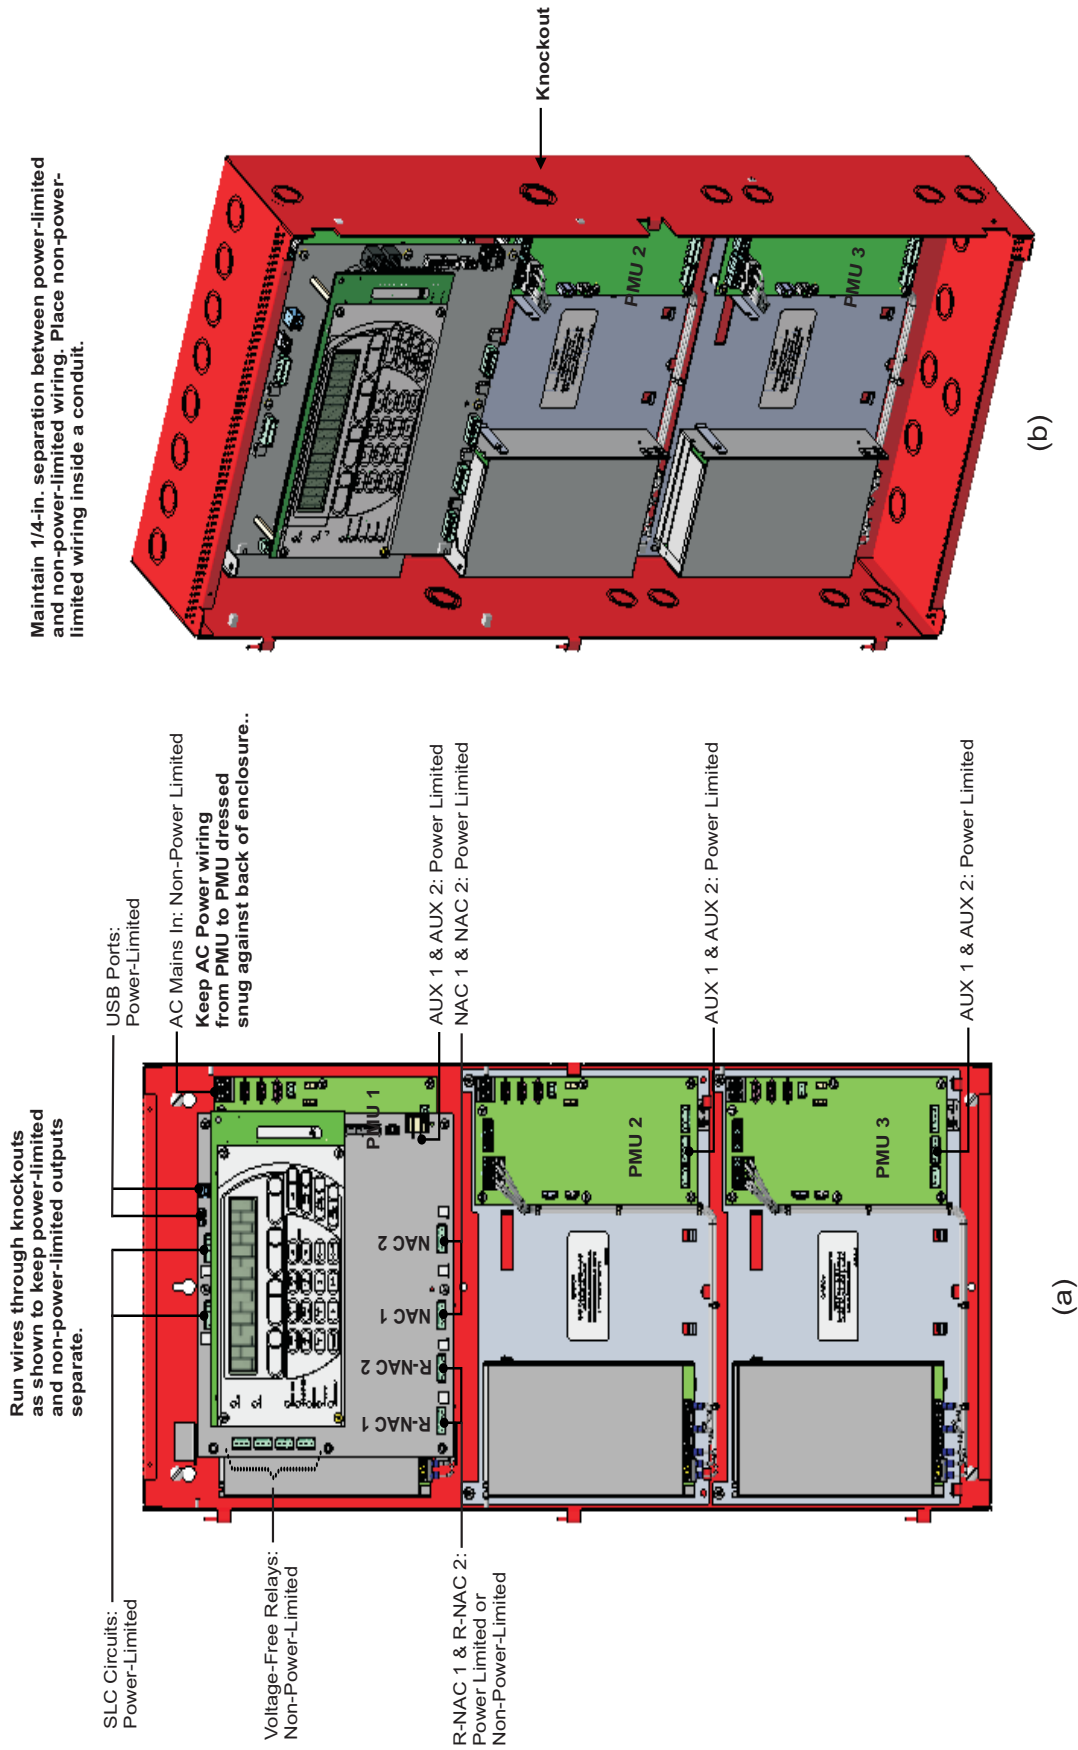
Example Showing Wiring in 3-Tiered Enclosure with Additional PSU/PMU Assemblies(a); Location of knockouts (b)
